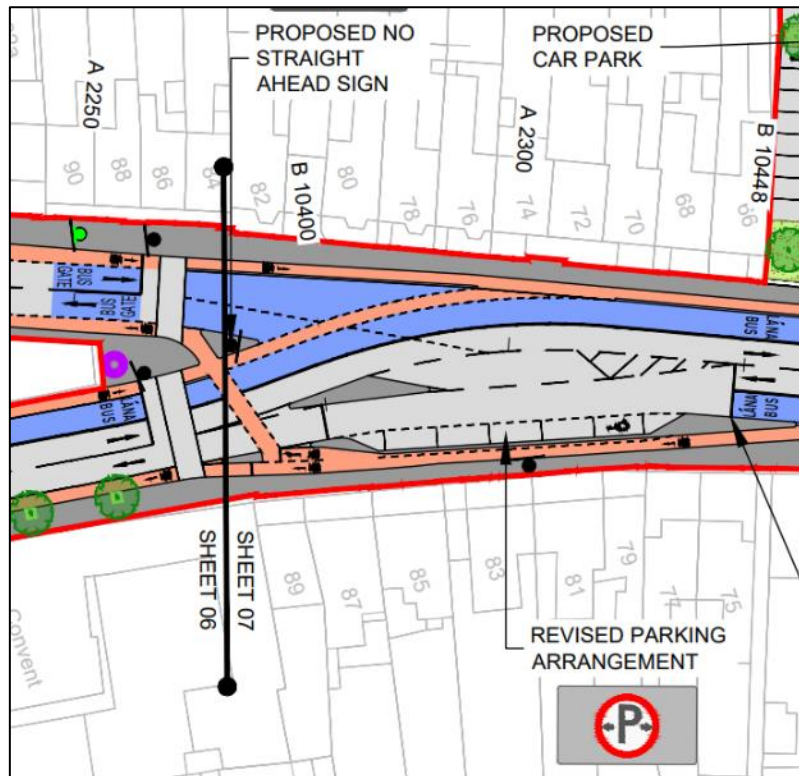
Junction of Kimmage Road Lower and Harold's Cross Road
